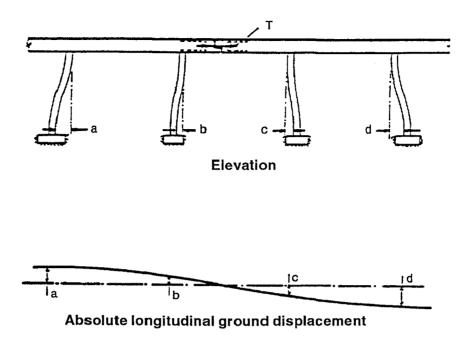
Restrainer forces from relative foundation movement (from ref. 18).
